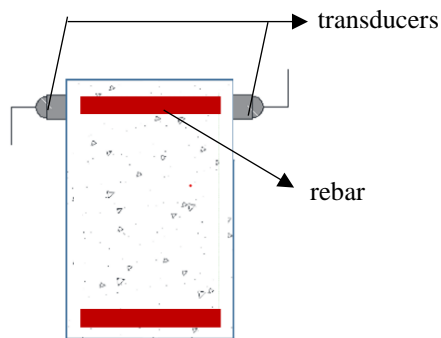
Cross section of reinforcement concrete with rebar parallel to transducers
